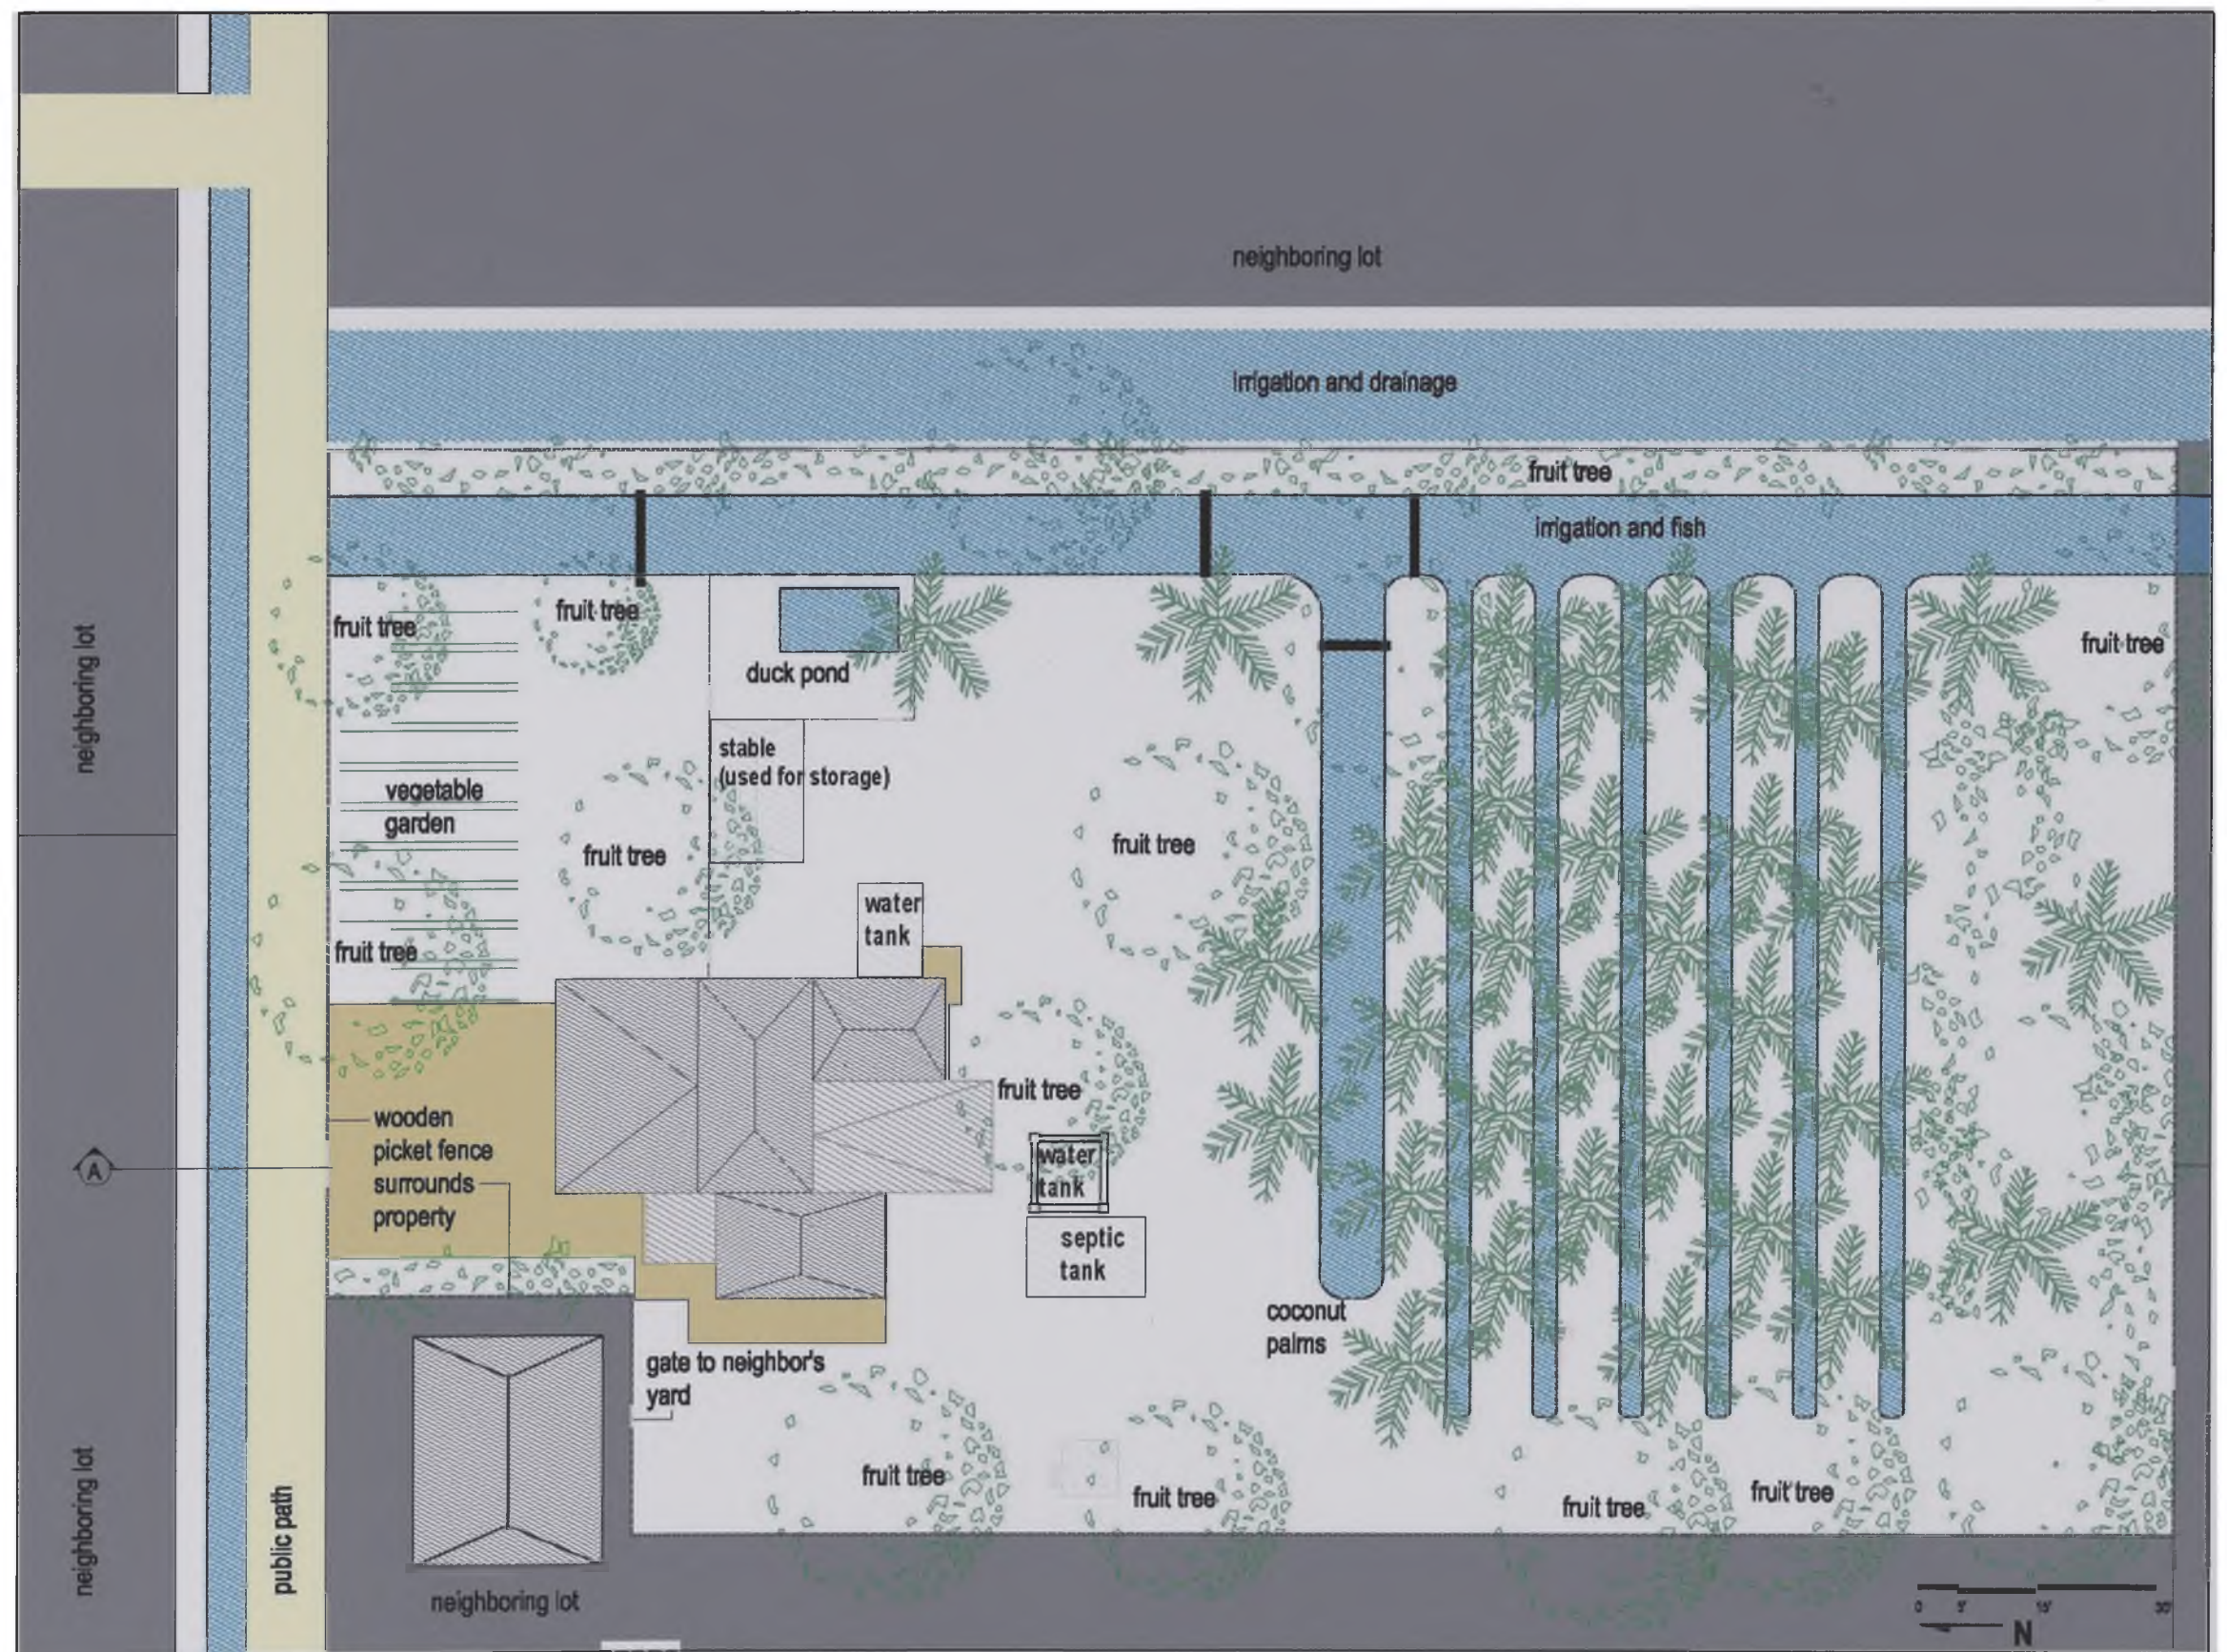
Site Plan of Jagan House. Water is used extensively in irrigation and drainage and for storage.
